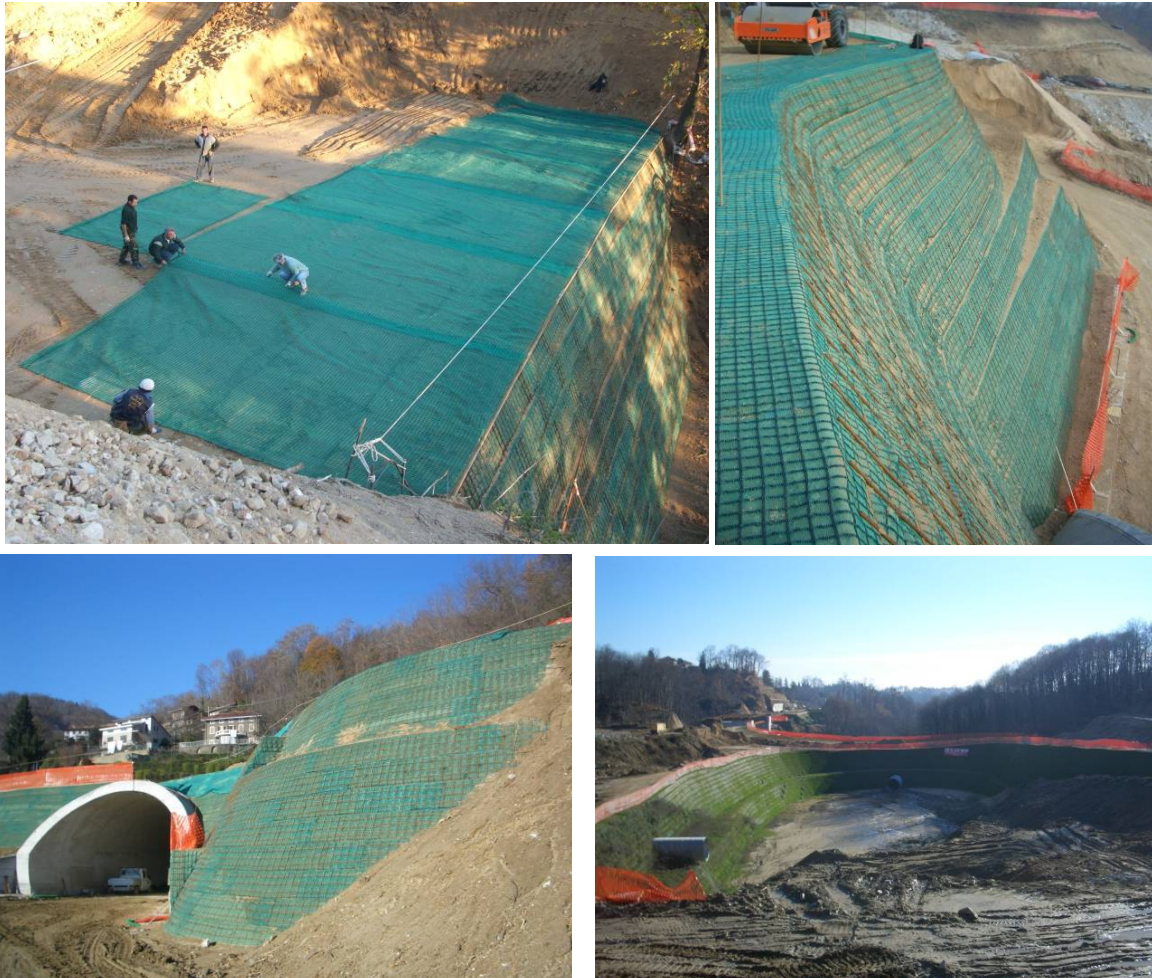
Construction of the reinforced soil road embankments of SR232 project
